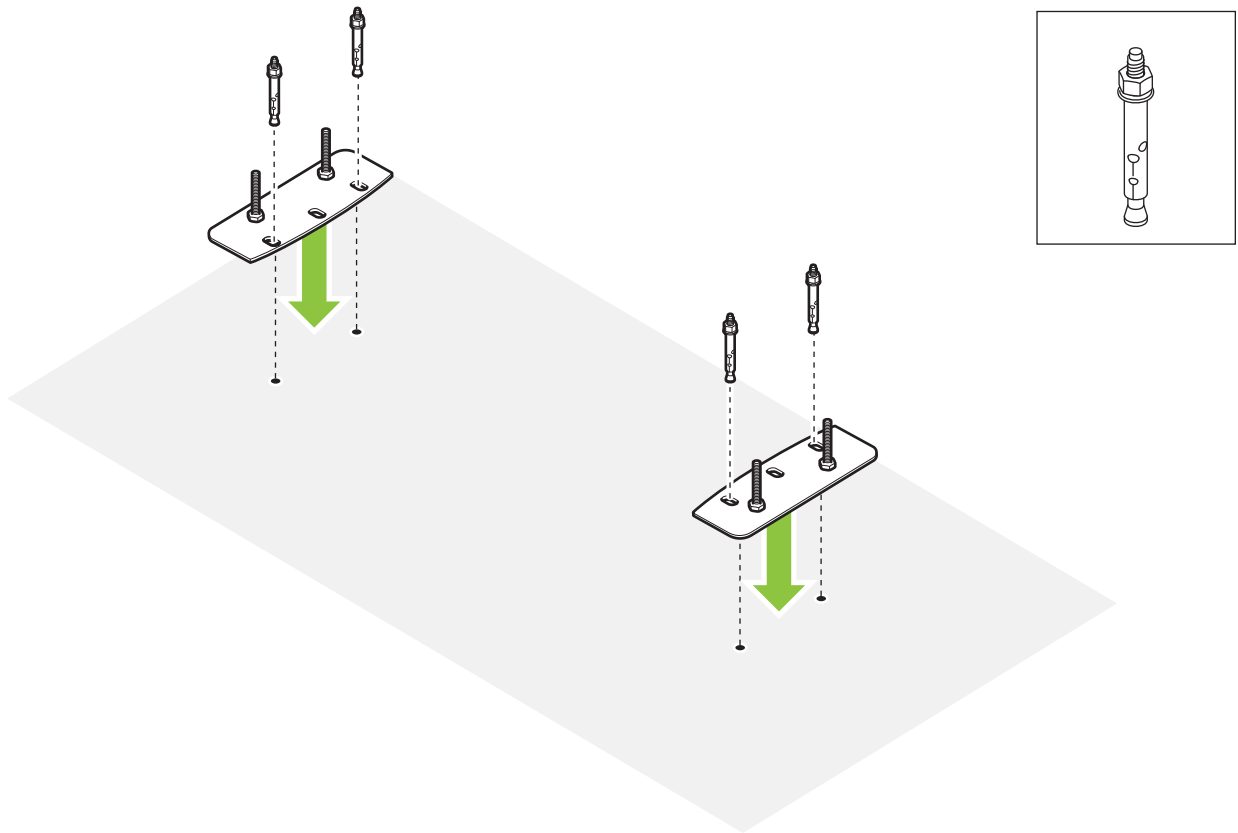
Floor Anchor for Concrete Floor on Bottom Landing
